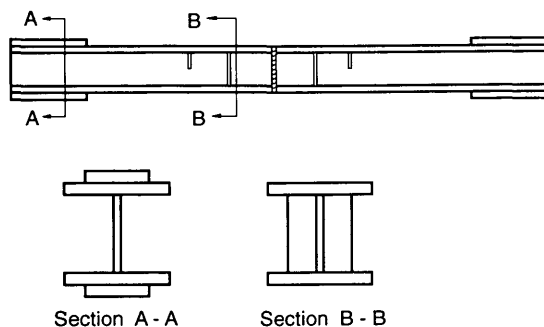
Elevation of full-scale beam sample, showing details of two sections.
